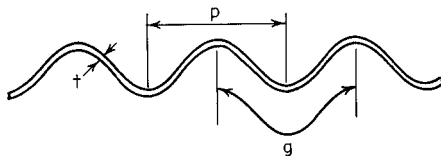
Cross section of corrugated sheets.^{9.42}
